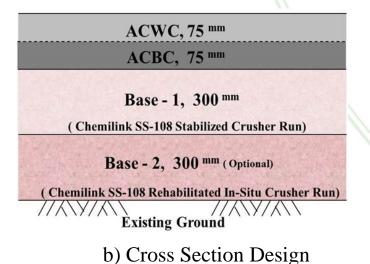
Typical Cross Section Designs of Pavement Rehabilitation at Taxiways
